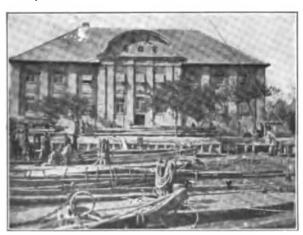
TELEPHONE CENTRAL OFFICE BUILDING, TIENTSIN.
